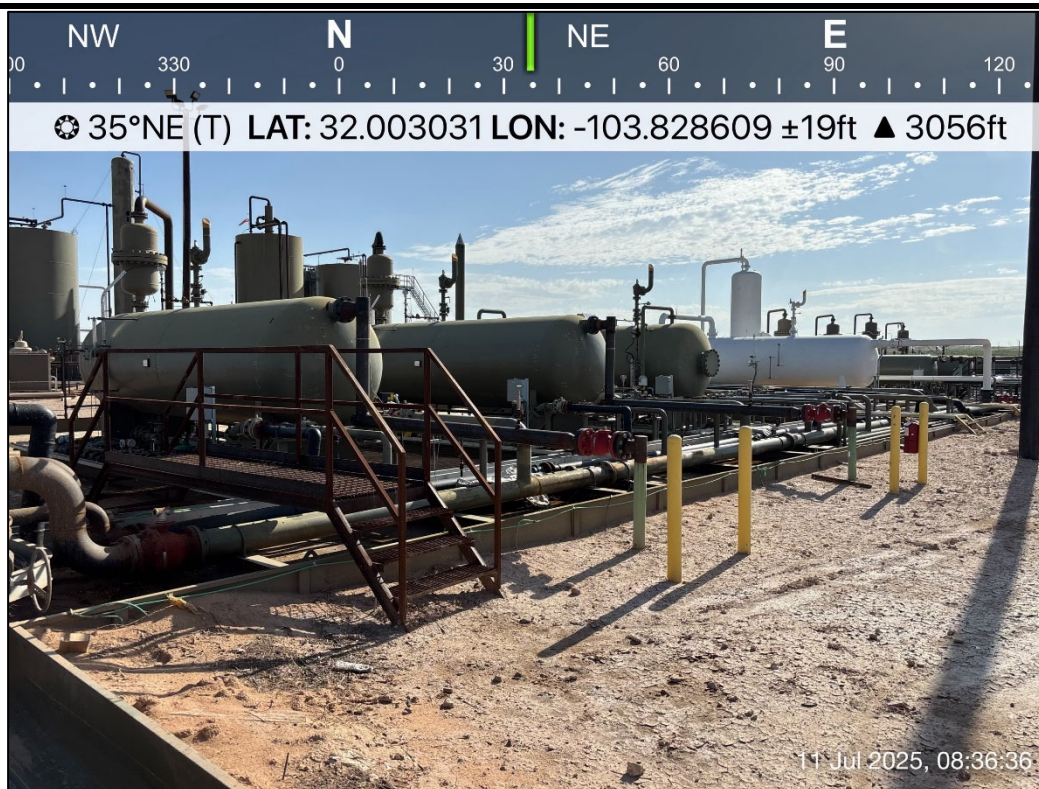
Northeastern view outside of containment during liner inspection activities. 7/11/2025
